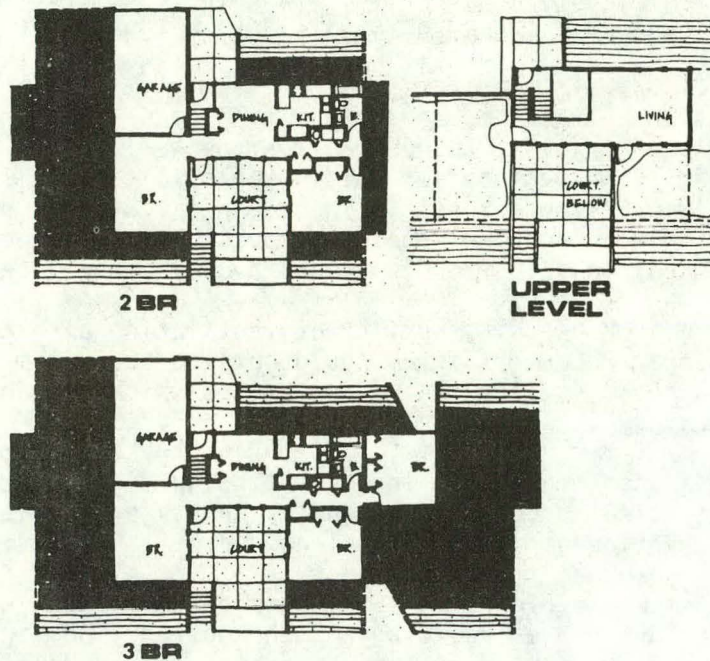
Earth protected house, floor plan (drawn by John Carmody).
